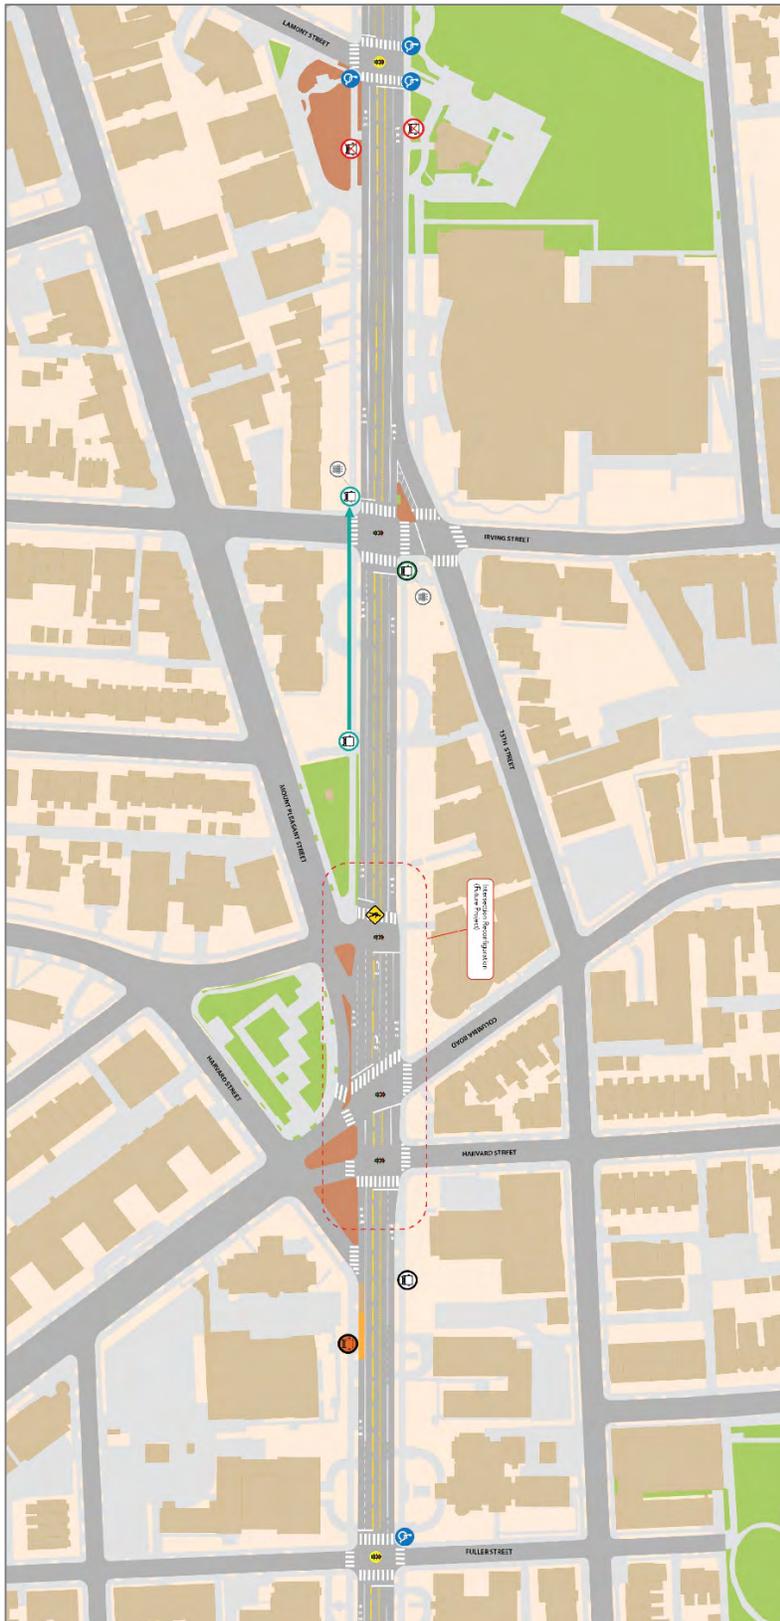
Recommended Improvements – Fuller Street NW to W Street NW
